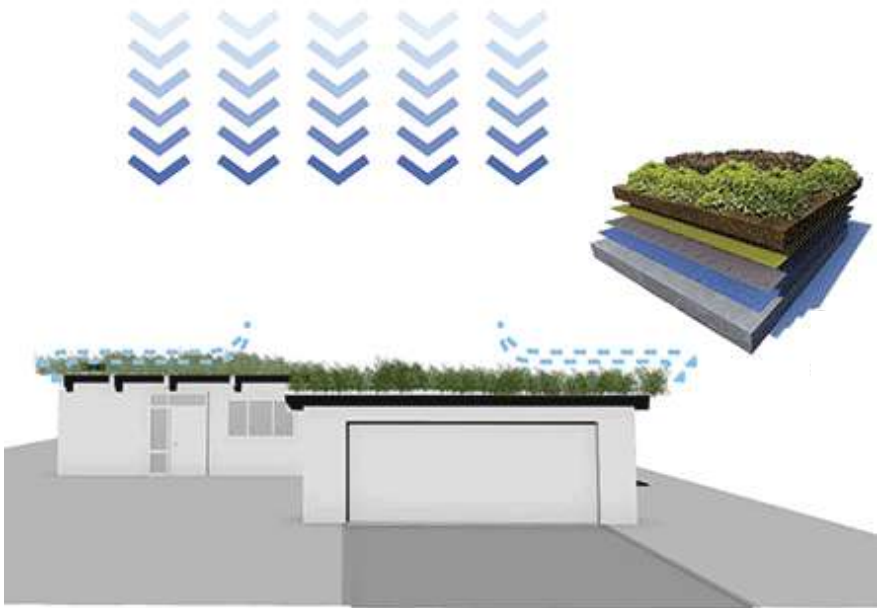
Diagram of a Green Roof adapted from the Houston-Galveston Area Council.
